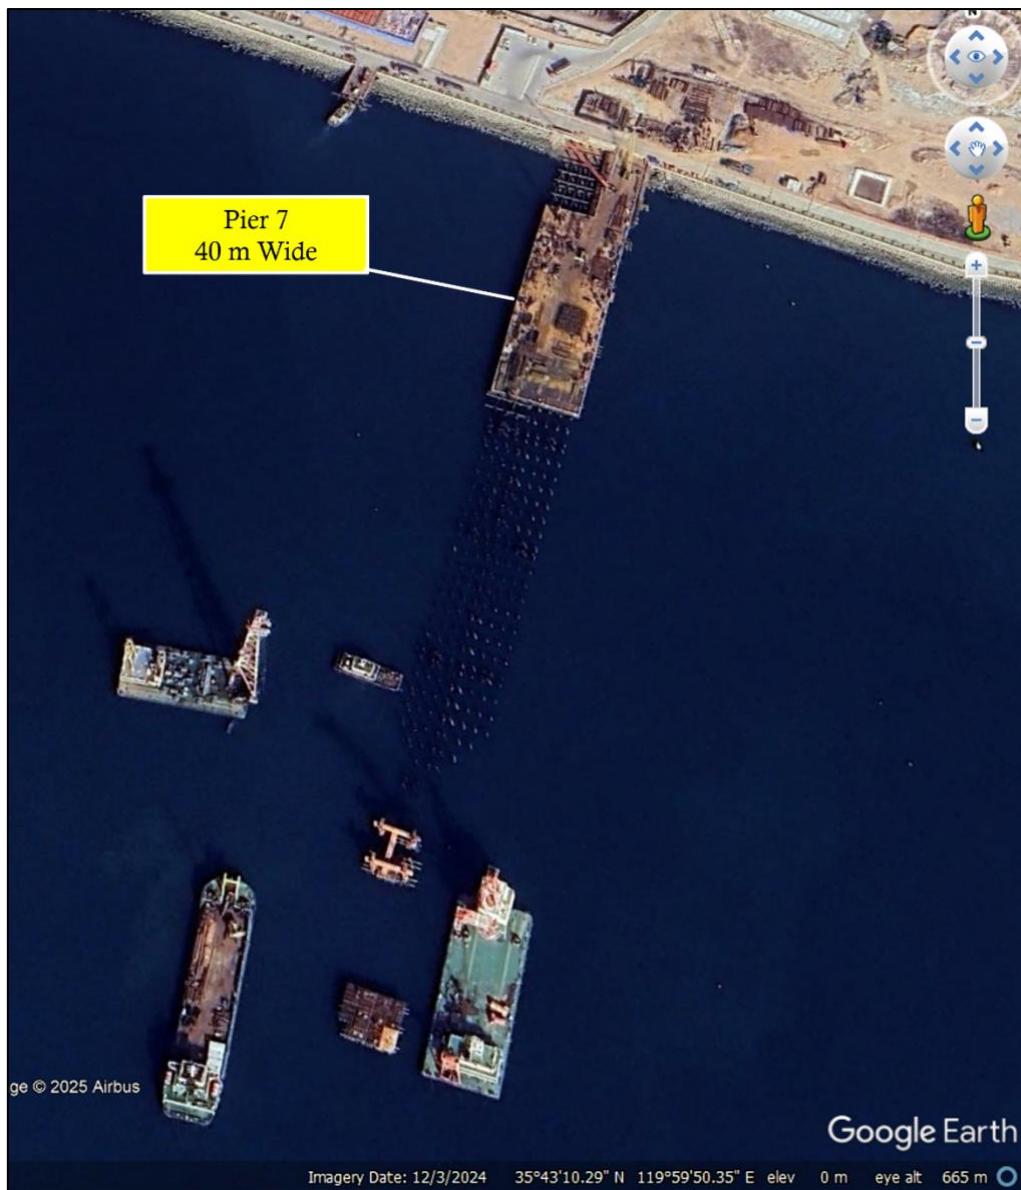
New Jetty (Pier No 7) under construction (Google Earth 03 Dec 2024)
